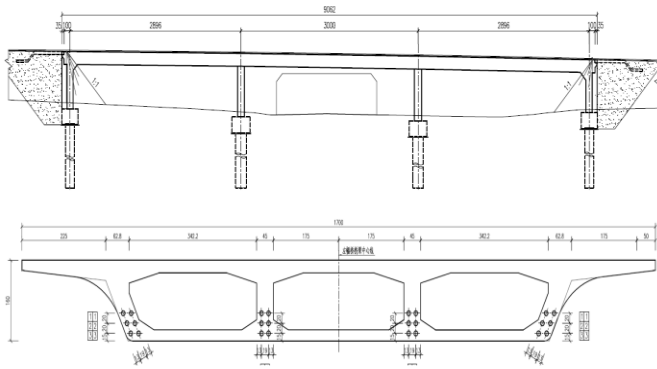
Front view and cross-section of the Maluanshan integral abutment bridge in Shenzhen.
